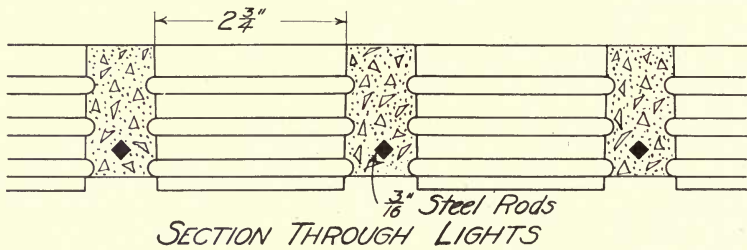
TYPICAL VAULT LIGHT CONSTRUCTION.
